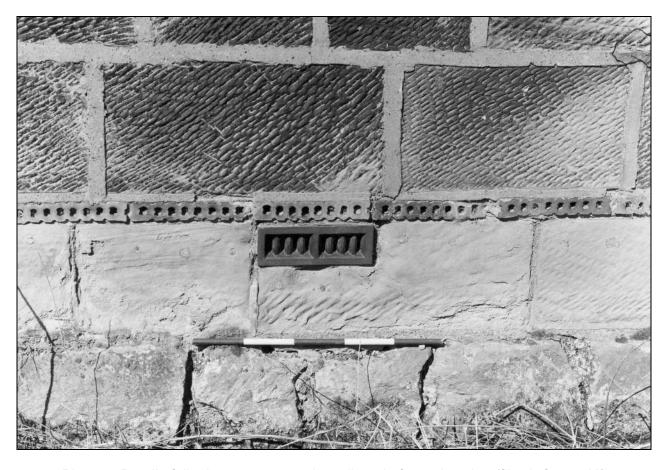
Detail of tile damp-course and ventilator in front elevation (film 3, frame 12)
